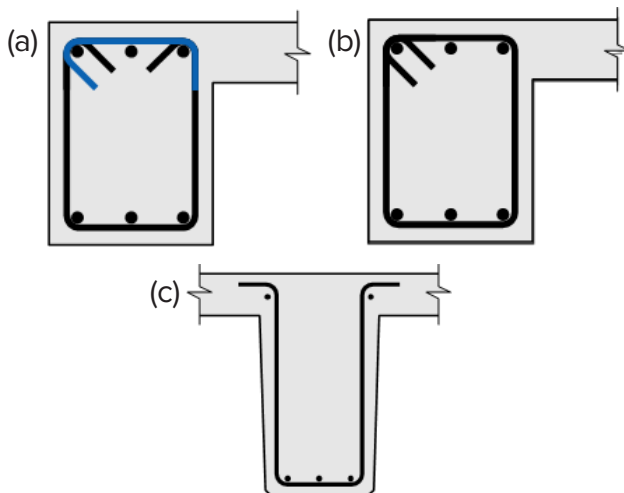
Stirrup cage options: (a) two-piece stirrup; (b) one-piece stirrup, and (c) stirrup with out-turned hooks. (Image courtesy of CRSI.)
